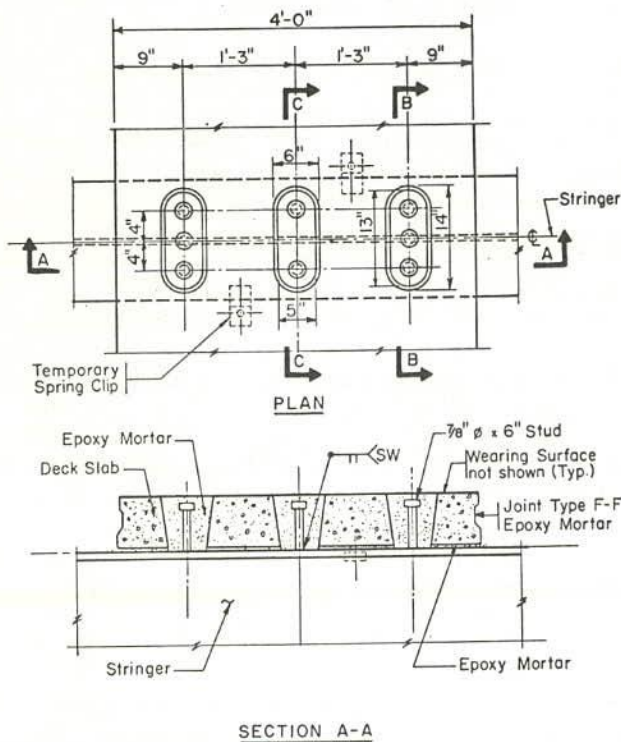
Welded stud connection for precast slabs to steel beams (New York Thruway).
